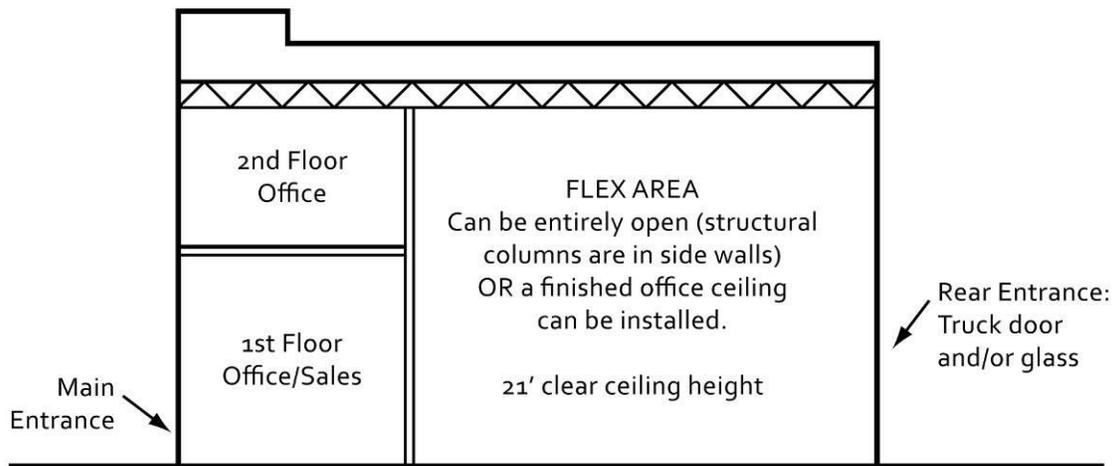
Sectional View of Two-Story Flex-Tech Multi-Use Facility
